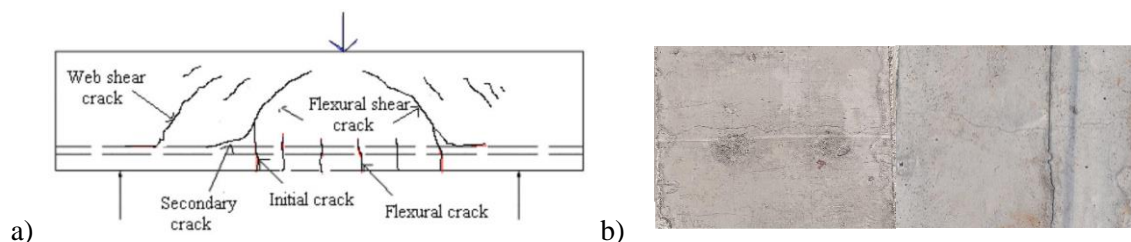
Flexural Cracks in Concrete Beams, a. Types of Cracks in Beams, and b. Flexural Cracks in Beams
